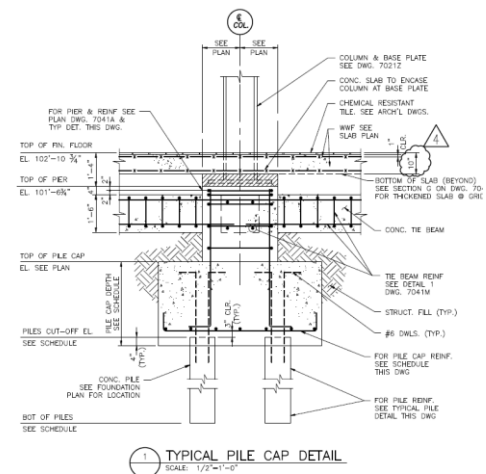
Typical Pile Cap Detail. Courtesy of Project Engineer.
